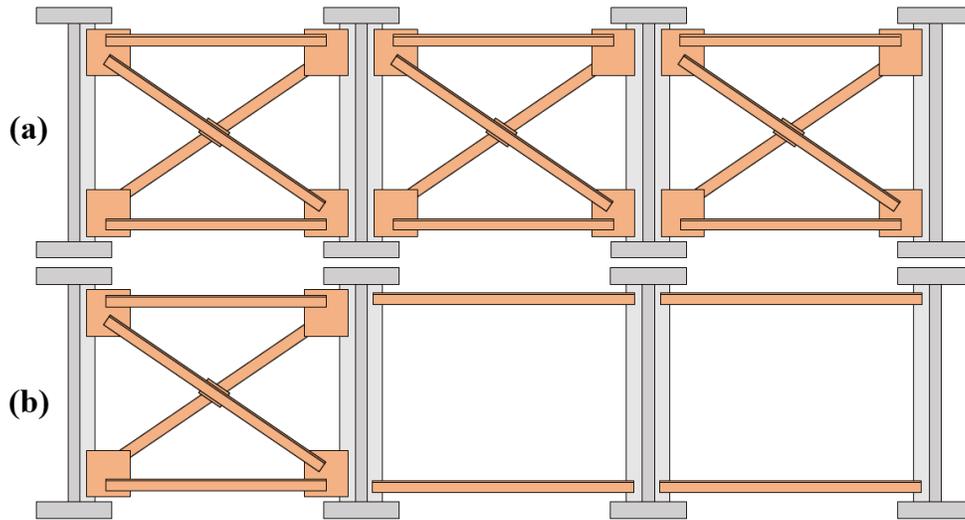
Example of typical bracing system with full cross-frames (a) and using lean-on bracing (b)
